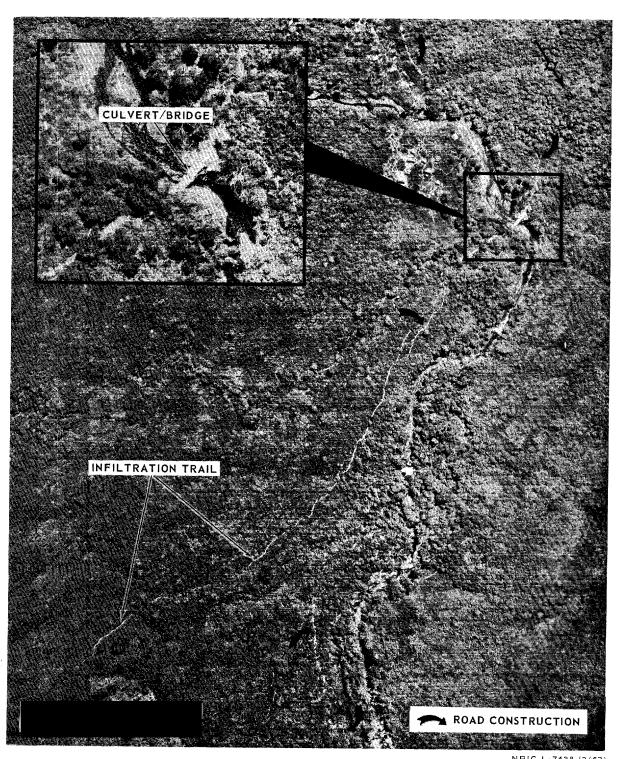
ROAD CONSTRUCTION (16-39N 106-25E), ROUTE 92, LAOS
